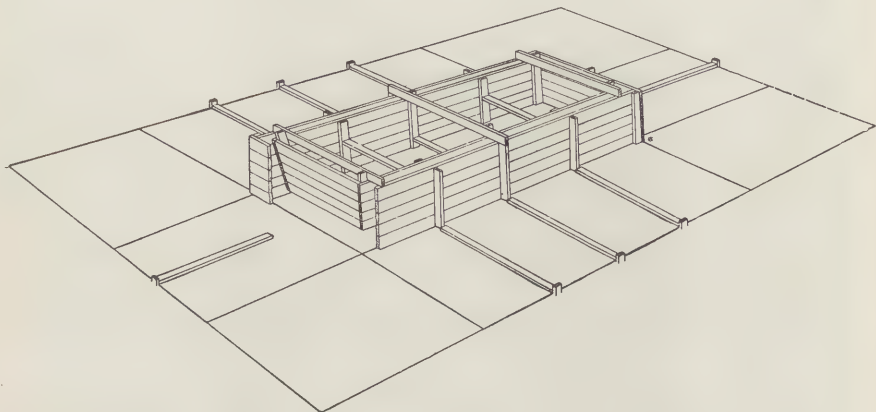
The easiest form to construct for building concrete tanks is of the rectangular shape. The inner form is supported on the outer after the concrete tank floor is in position.
